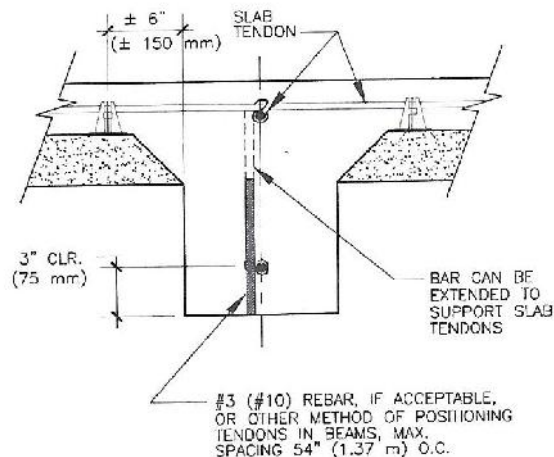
SLAB TENDONS CROSSING BEAM (SECTION)
